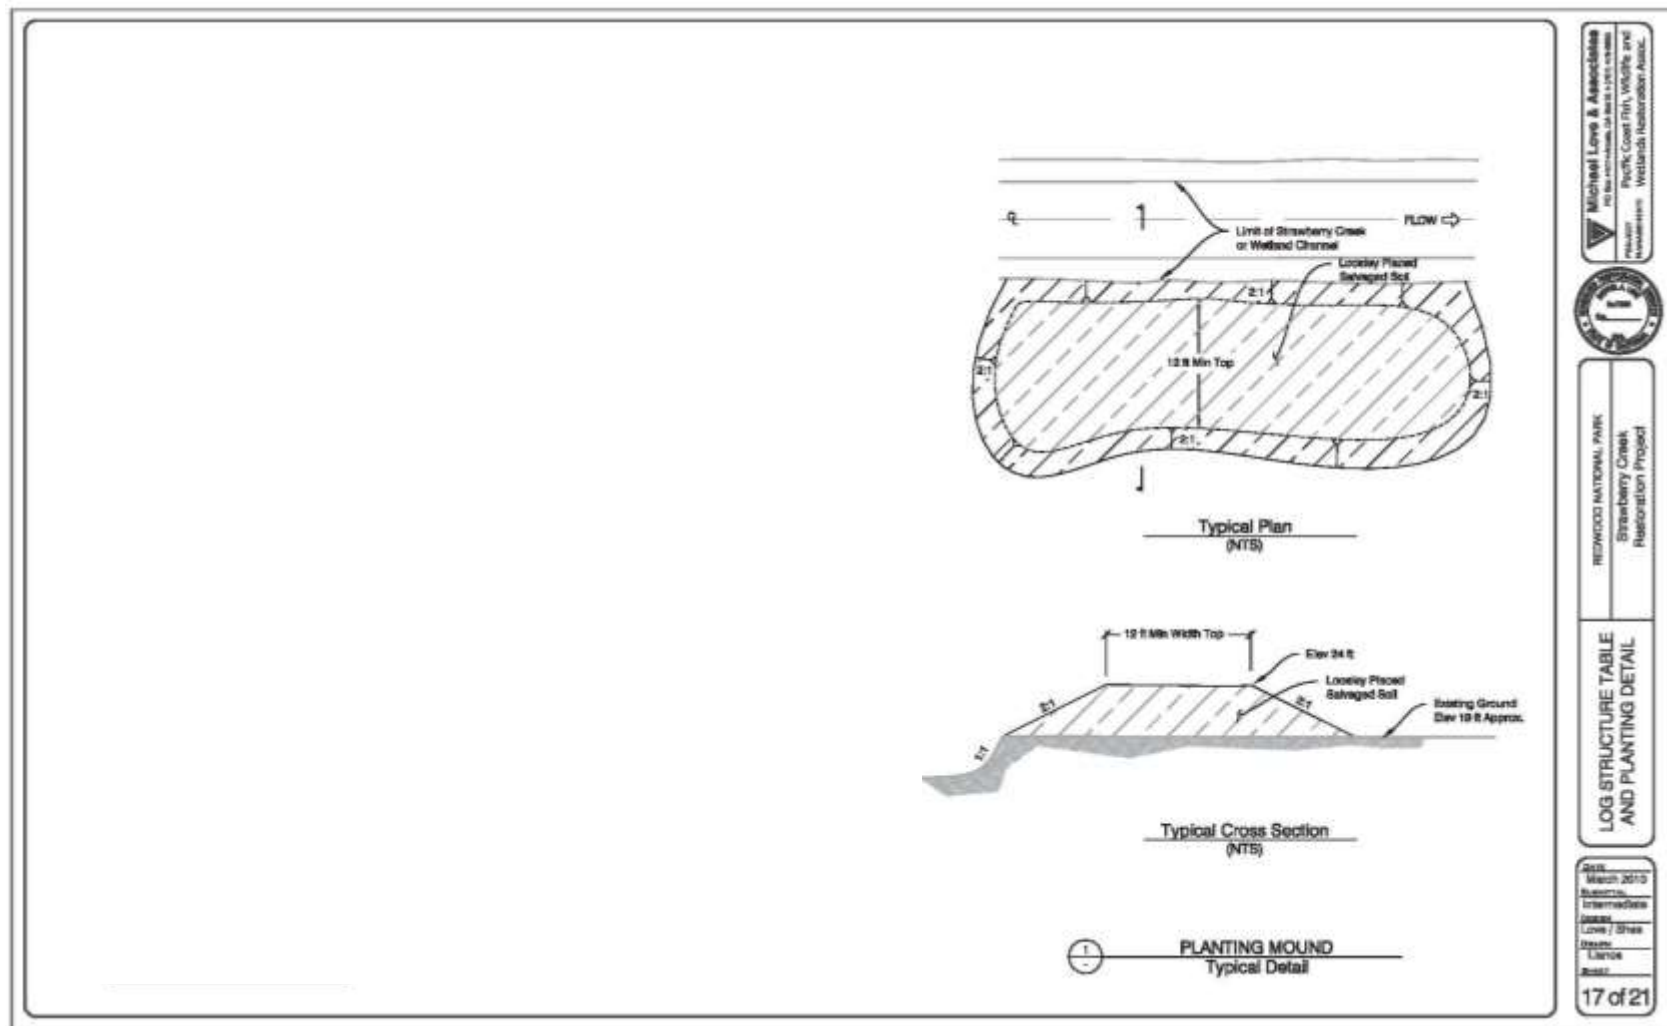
Alternative 3-planting mound specification (adapted from Love and Shea 2010)
